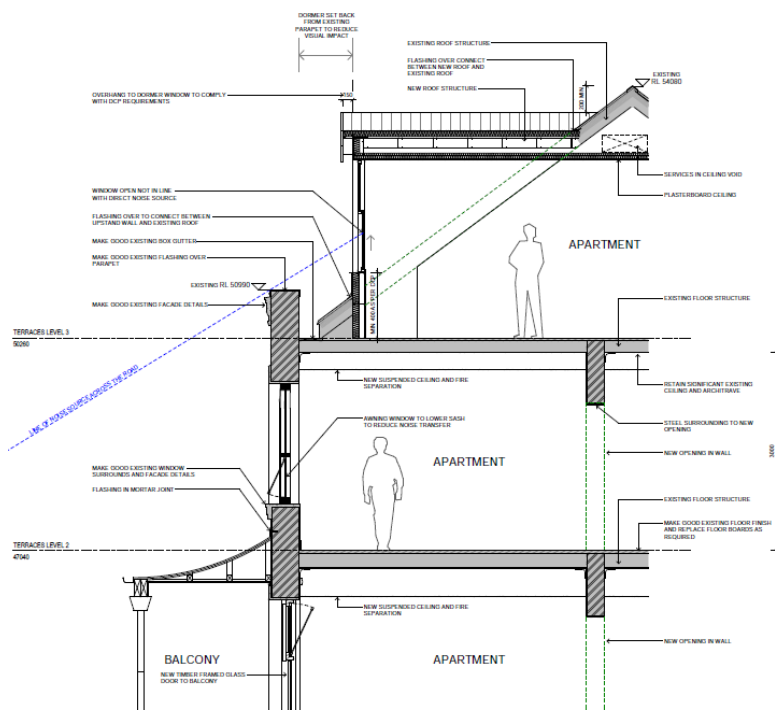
Section plan showing proposed acoustic attenuation to the terraces
